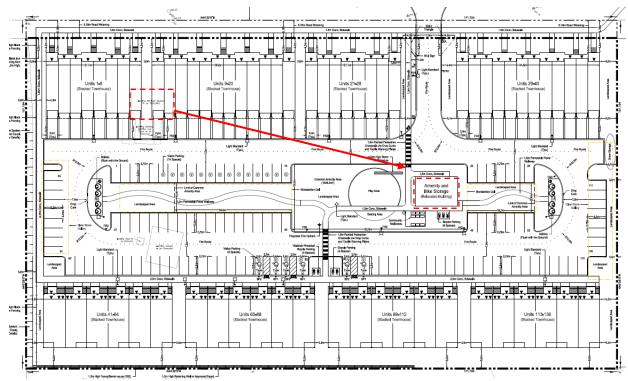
Excerpt of site Plan of the Proposed Development of the Subject Lands noting approximate existing location of heritage dwelling and proposed new location within the central amenity area (MHBC, 2024)
